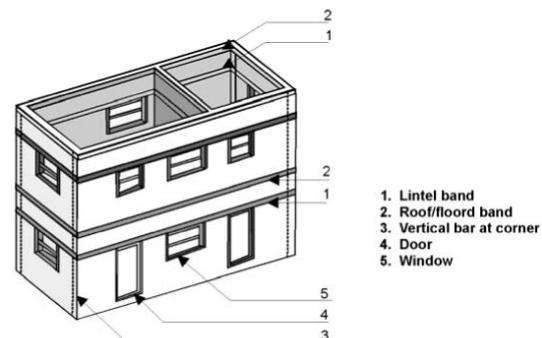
Overall arrangement of earthquake resisting elements in double storeyed houses having flat roof (Roof not shown)
